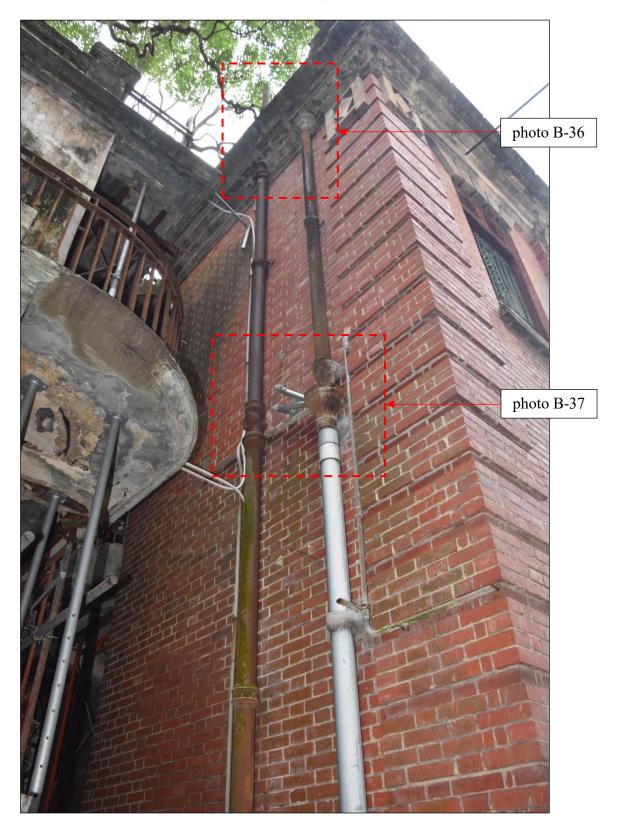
Main Building The cast iron vent pipe and cast iron rainwater downpipe with two hoppers installed at south-west elevation (rear elevation) near south corner, (8<sup>th</sup> October, 2024)
